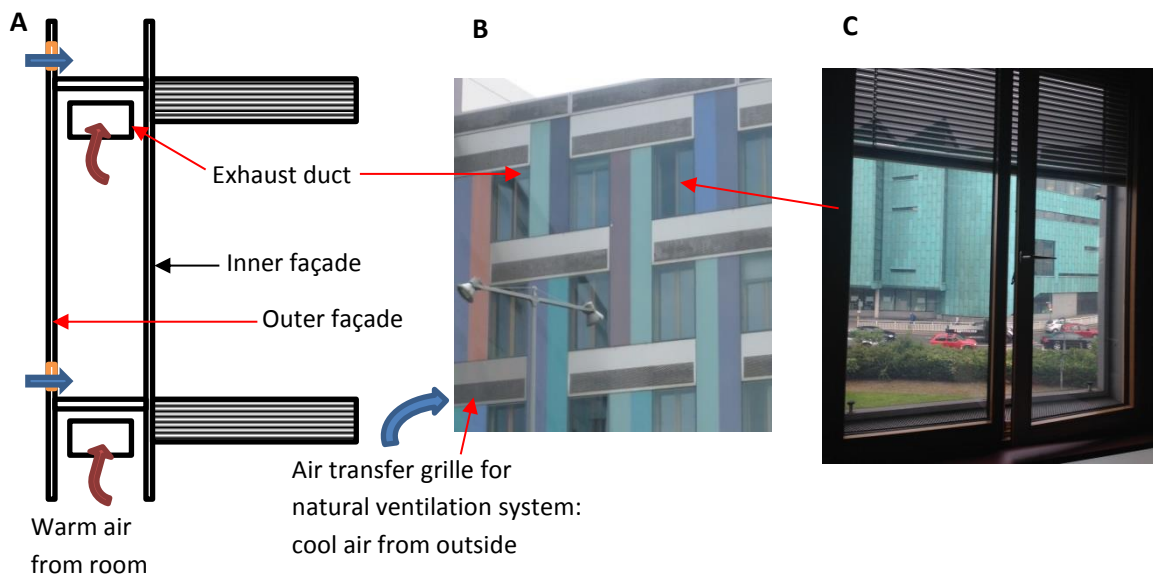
Double skin façade of Building 1: (A) Section through double skin façade; (B) Elevation of façade; (C) Window opening from inside the building
